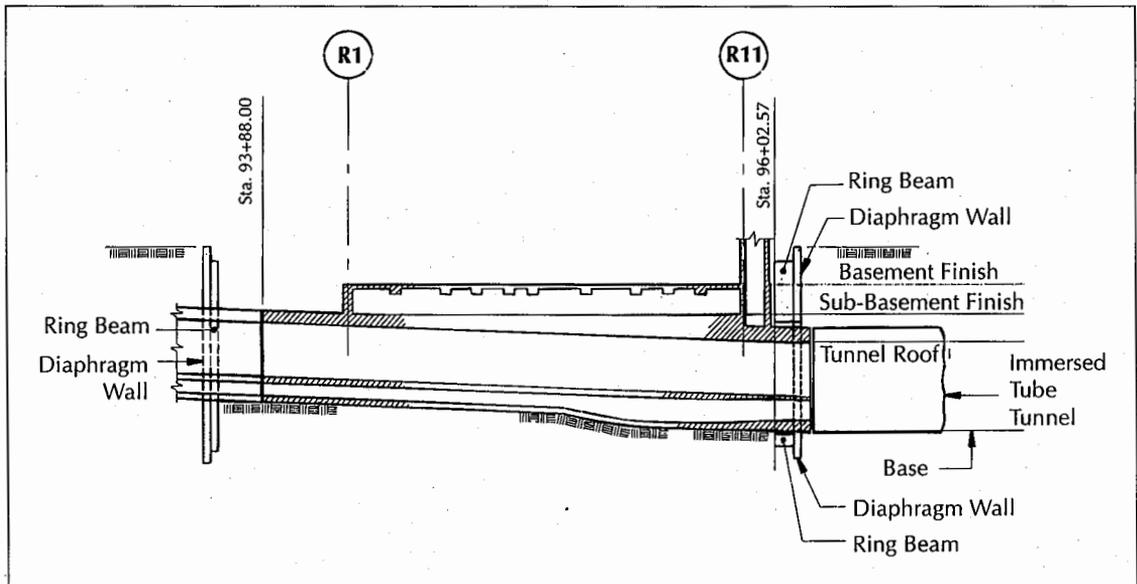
Longitudinal section through the cofferdam and Ventilation Building No. 6.
